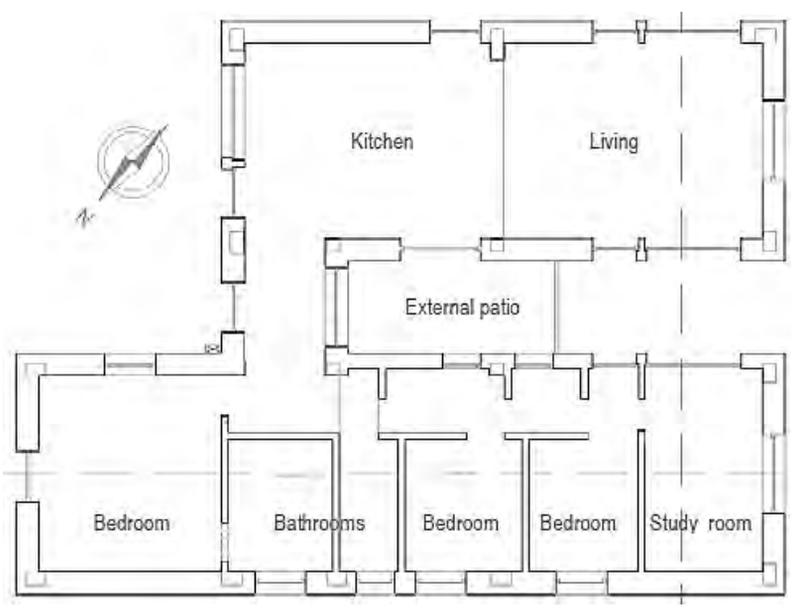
ARCHITECTURAL DRAWINGS AND CONSTRUCTION SITE PHOTOS
